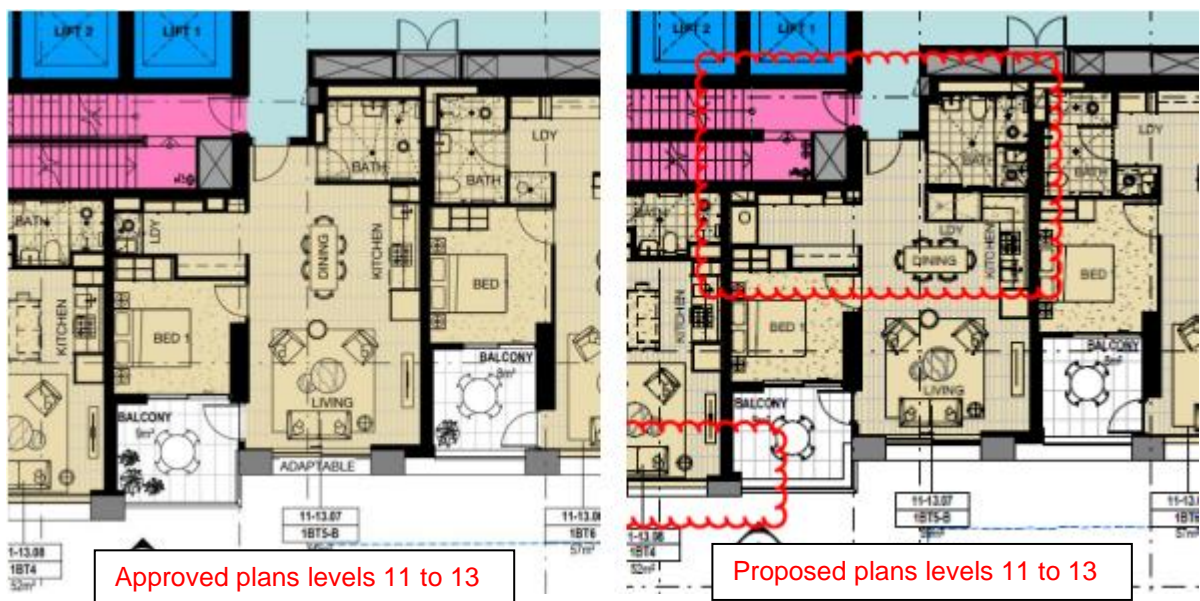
| Adaptable apartment bathroom reconfiguration (Source: Applicant's modification report)
